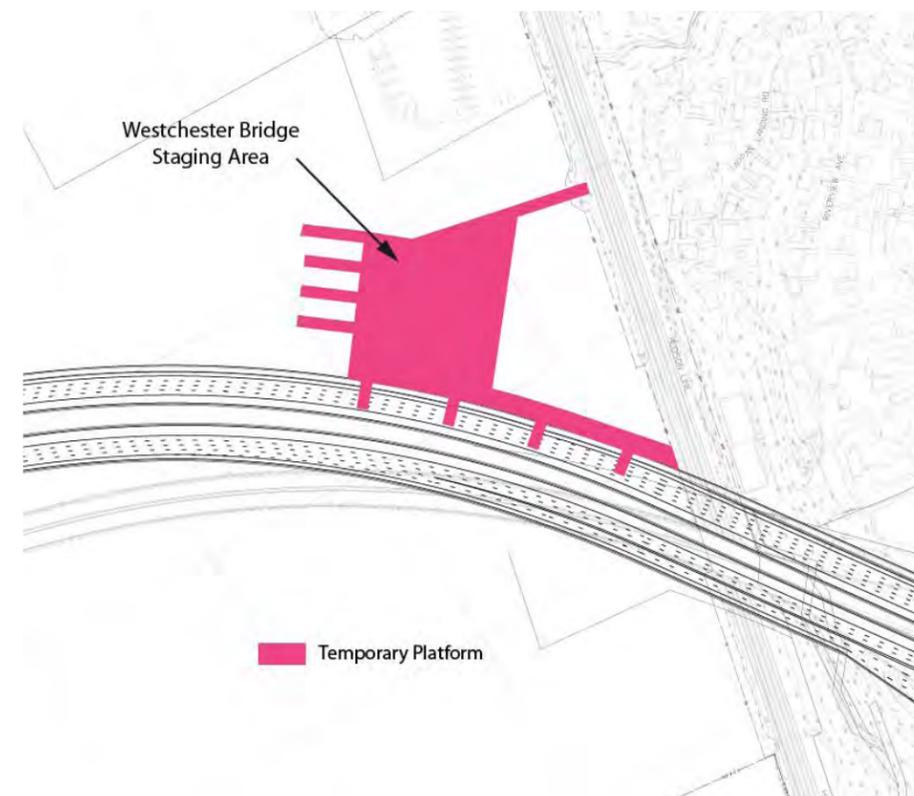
Westchester Bridge Staging Area (WBSA)
